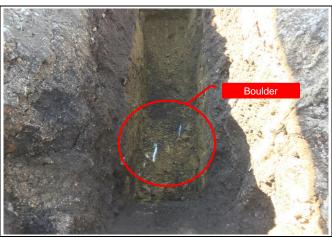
Excavation refusal on boulder at least 7 feet in diameter.
